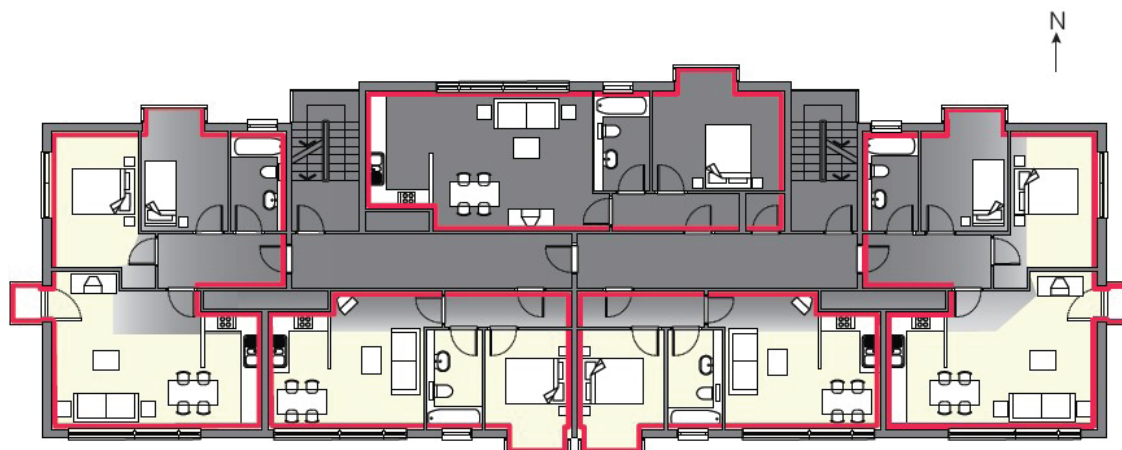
Careful layout design means that four out of the five flats shown have a south-facing living room
